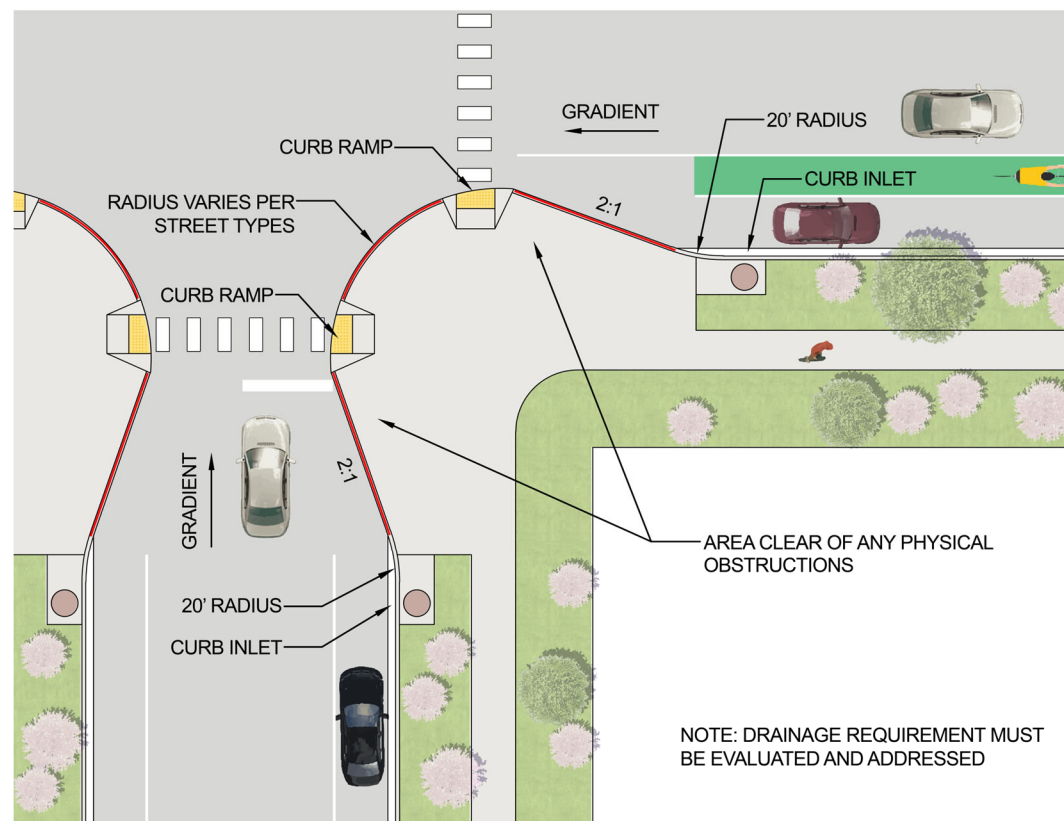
INTERSECTION POP-OUT DETAIL VIEW
